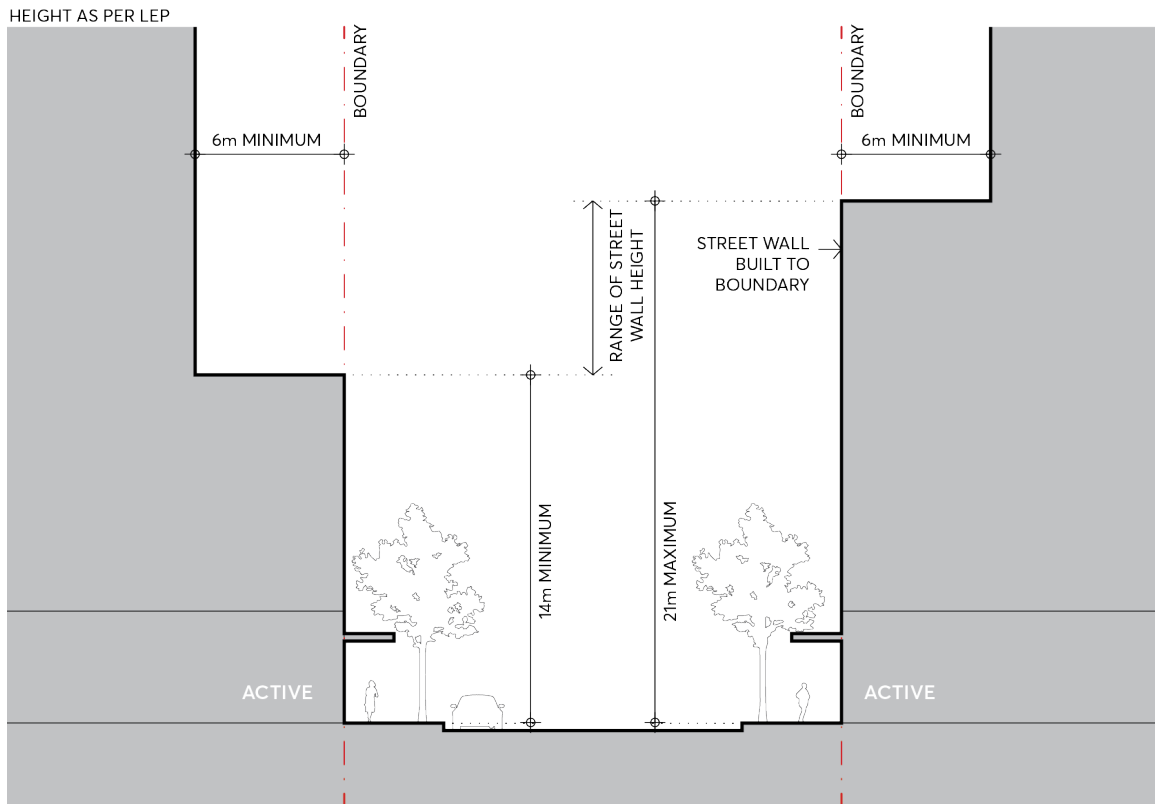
City East Block Phillip Street (Section B)
